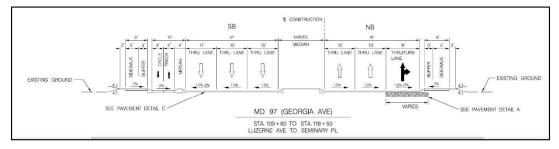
Proposed Typical Cross Section – Luzerne Avenue to Seminary Place
